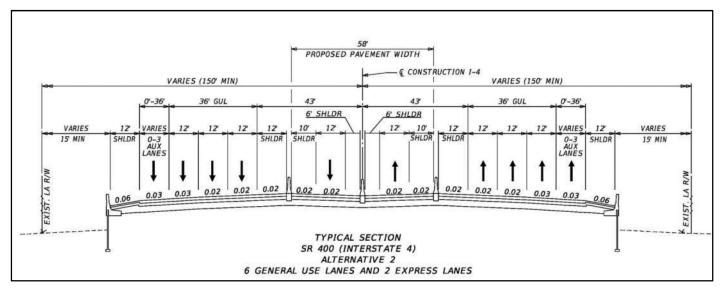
Typical Section – 6 GUL + 2 EL (No Reversible Lanes)
